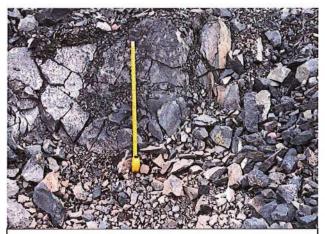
Test excavation on north-central area of site showing over-blast (fractured bedrock that retains its intact structure) to at least 0.7m depth
